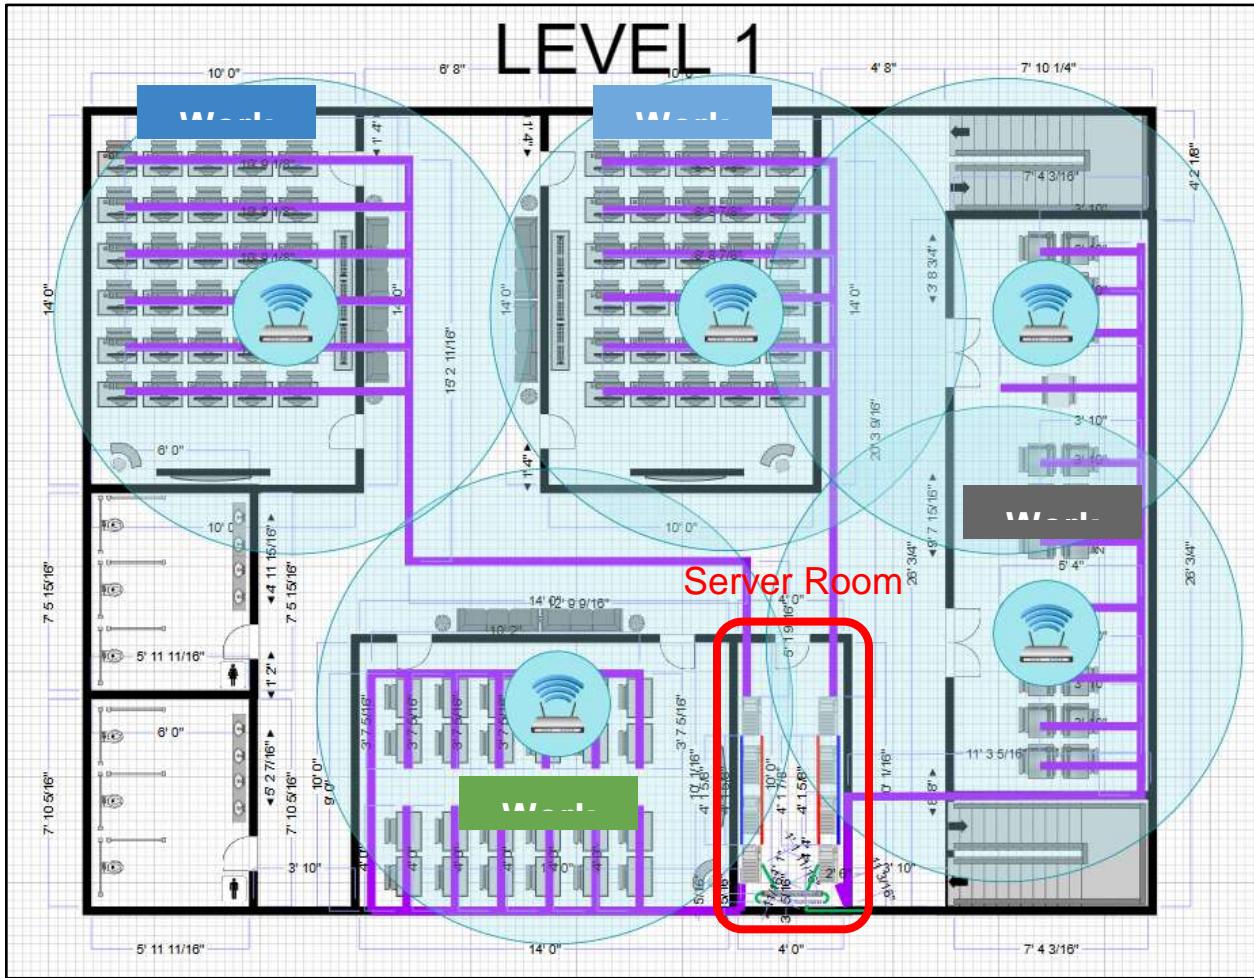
Physical Cabling and Connection Planning for 1st Floor (L1)
